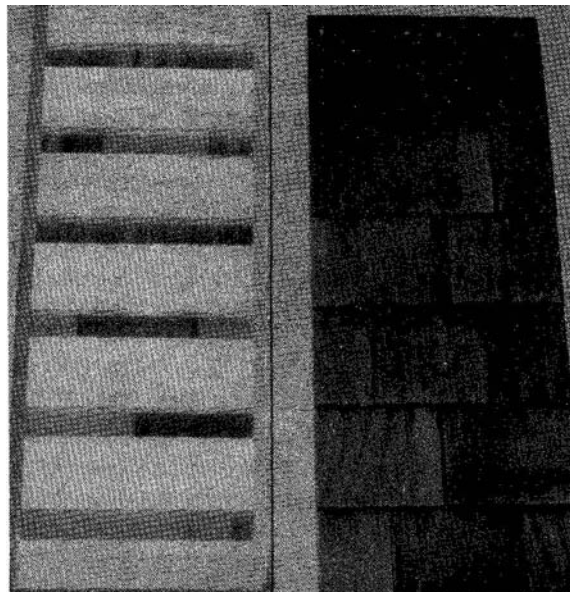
Shingle specimen panel (right) used for the modified class-C burning-brand test, showing construction of the deck or backing (left).
